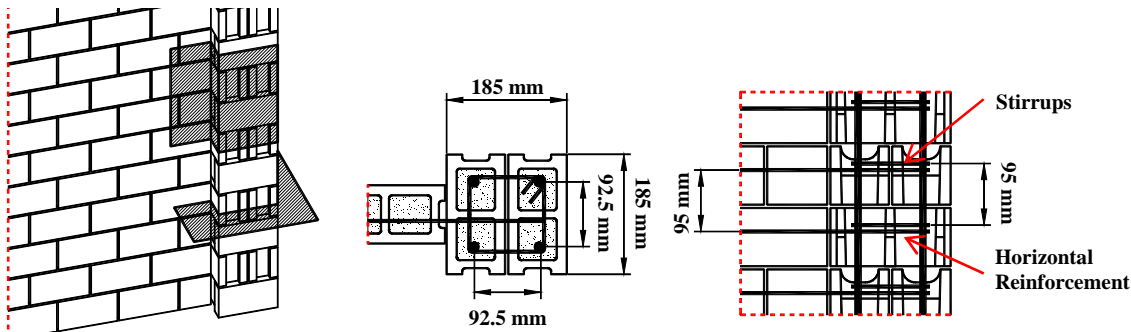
Confined Boundary Element Detailing of Half-Scale Walls
